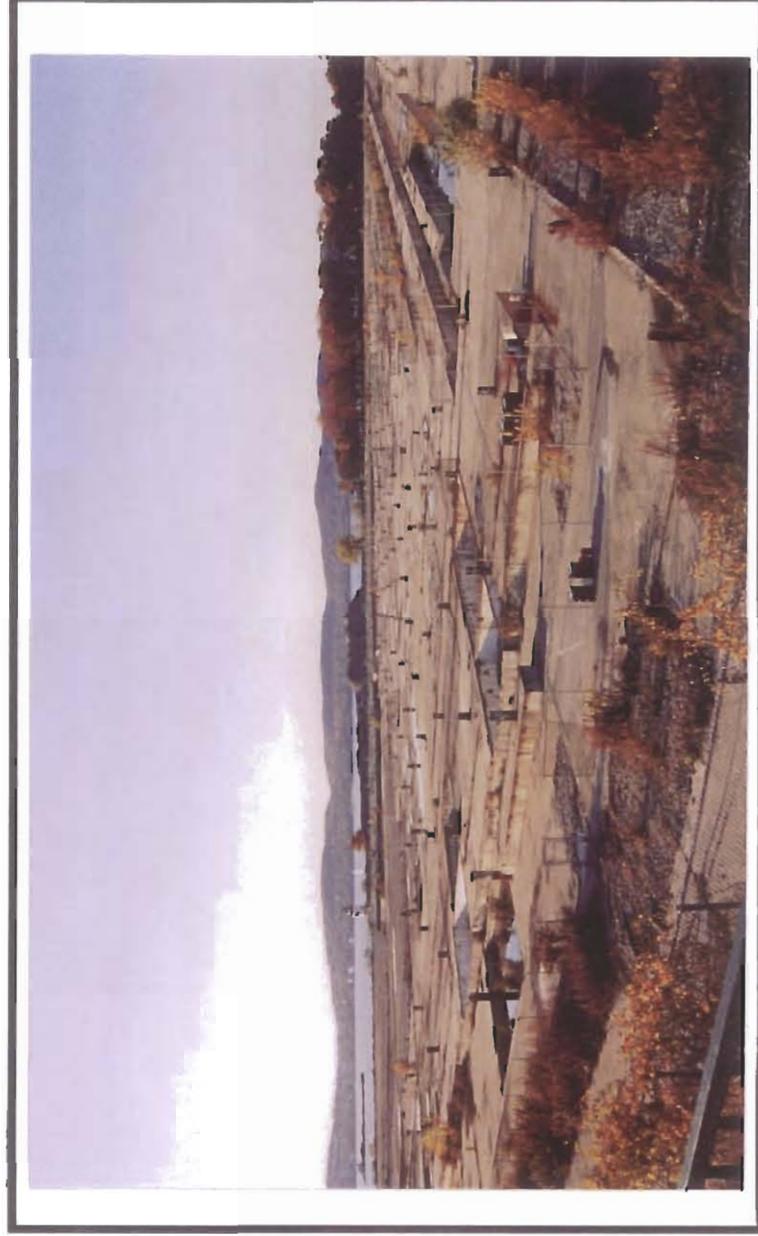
View to northwest from Beekman Avenue gives indication of the size of the buildings and the complexity of the floor and sub-floor. Entire area is man-made land; portions were filled in 19th century, but much of it was created shortly before 1931.
